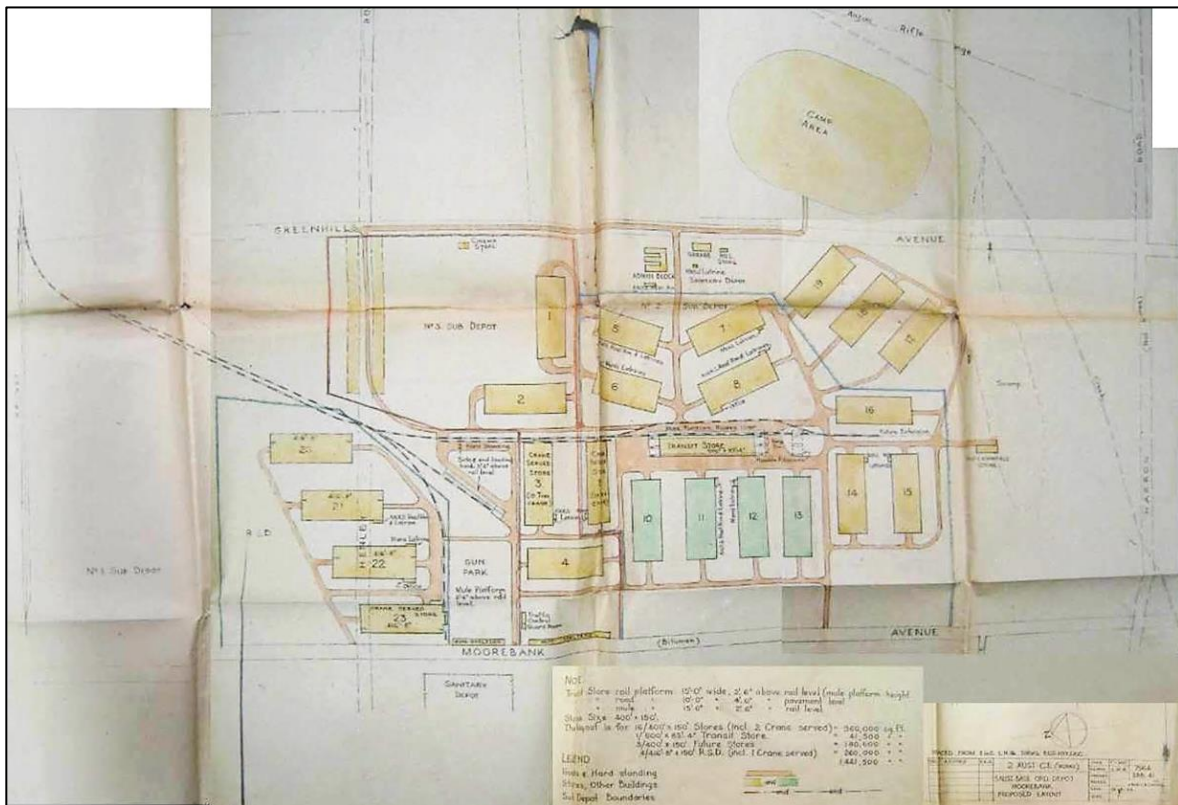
Plan of proposed layout of Moorebank Ordnance Depot 25/4/44 (Source: NAA: SP459/1, 420/7/1153)
